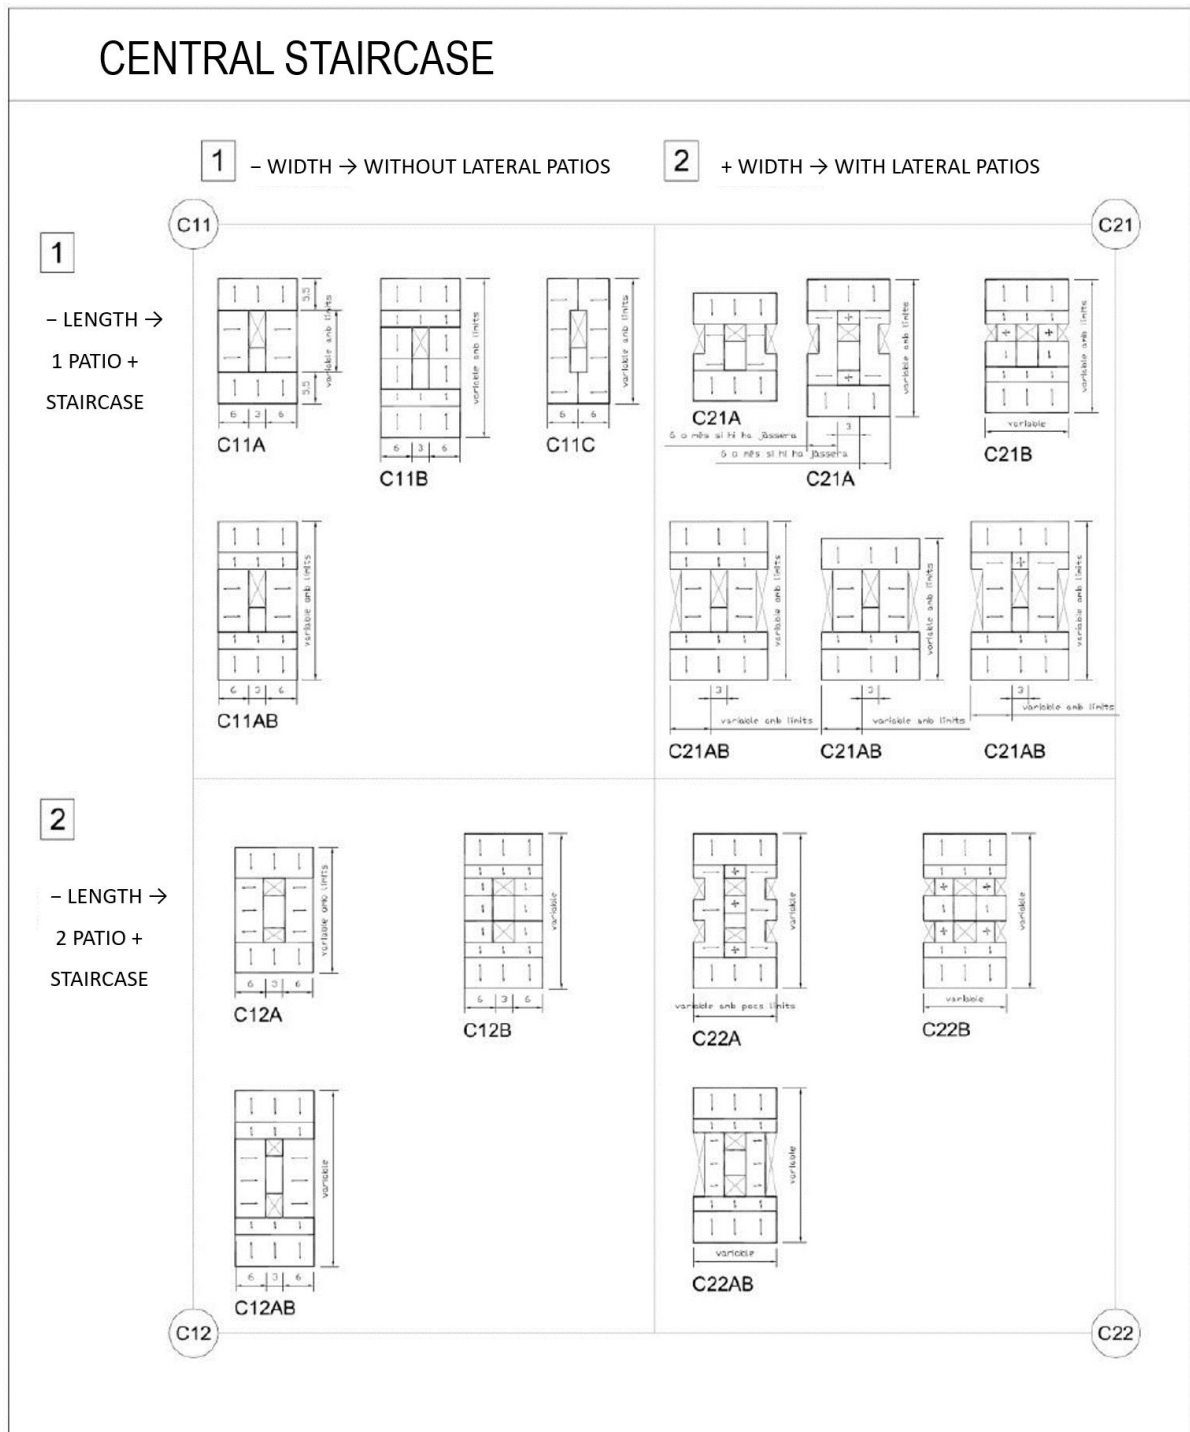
Schematisation of subtypes for the building typology with central staircase 'C' (adapted from Cornadó Bardón 2015).
